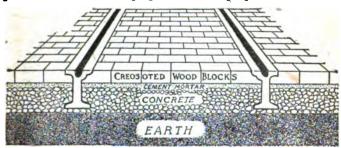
Section of Street Paved with Creosoted Wood Blocks.
